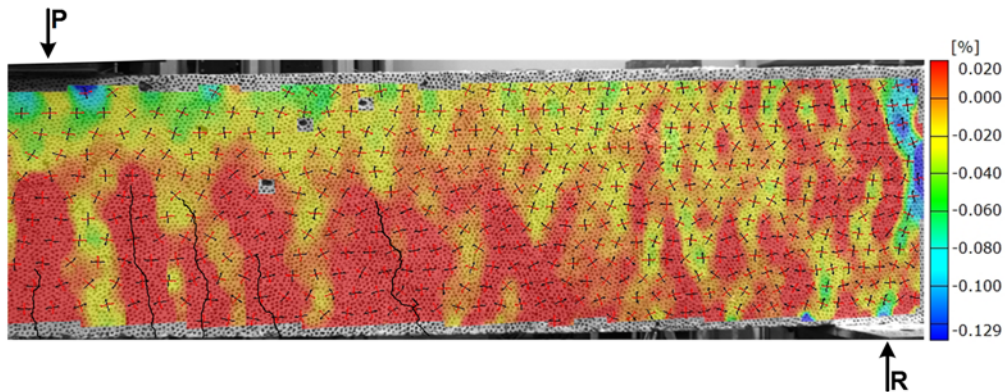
Scaled full-field concrete longitudinal strain ( $\epsilon_x$ ) across shear span for specimen RC18a at load 40 kips
